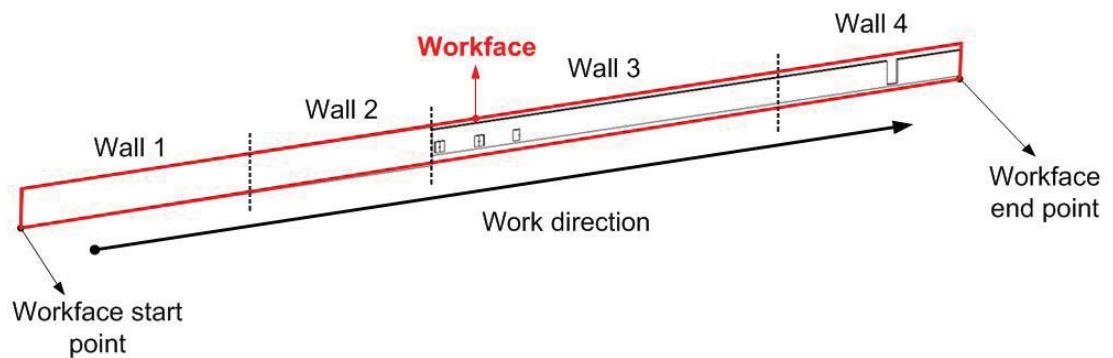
Geometric features recognized to plan scaffolding for a large masonry wall package
